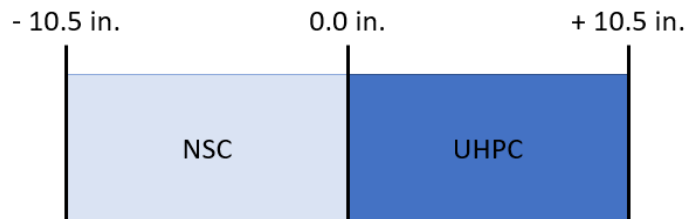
Four-Point Bend Test Fracture Plane Scale (in.)
